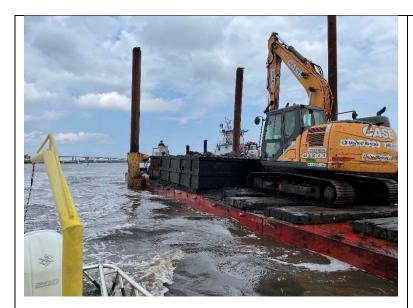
Additional photo of 26' Thruster Barge full of material offloading to the Hopper storage barge.
